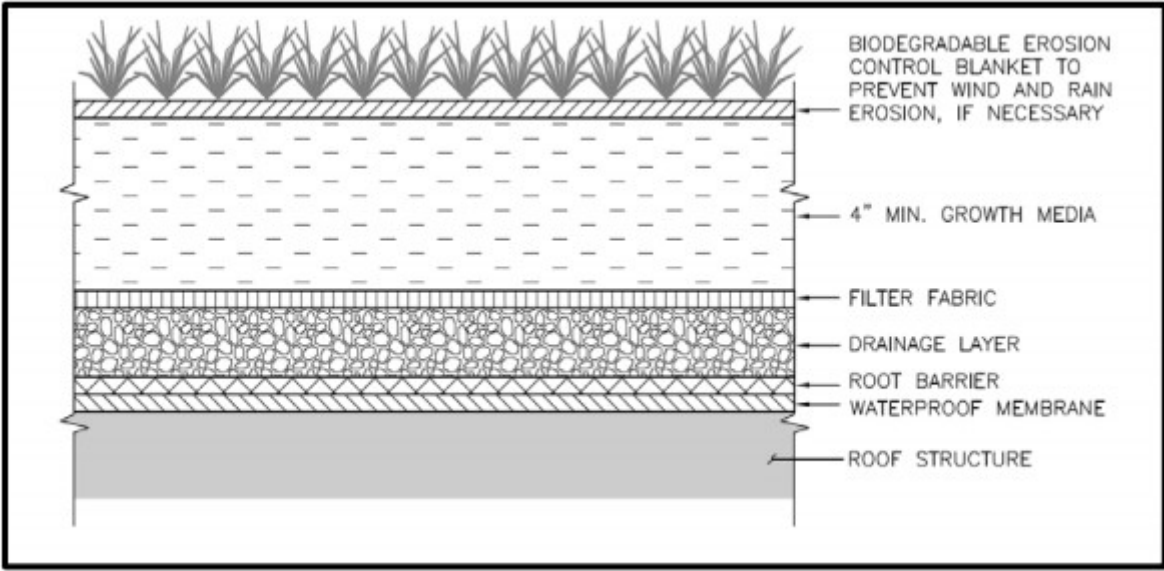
Intensive Green Roof Design Detail, Adopted from Seattle Stormwater Manual, 2016
